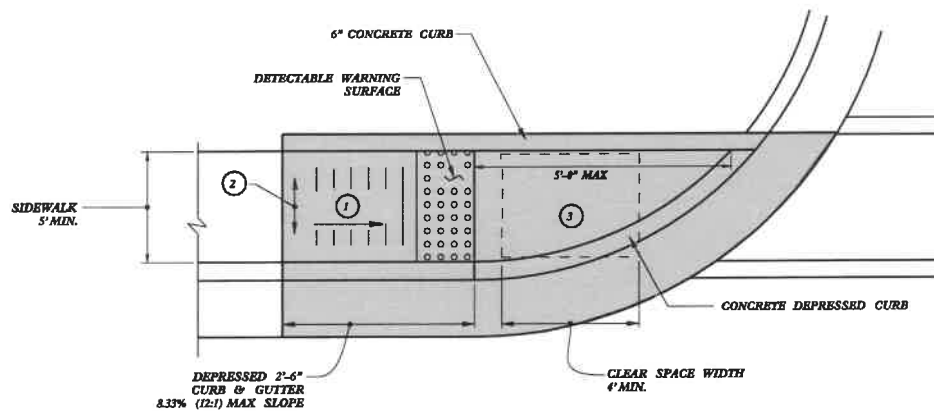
DETAIL SHOWING TYPICAL LOCATION OF CURB
